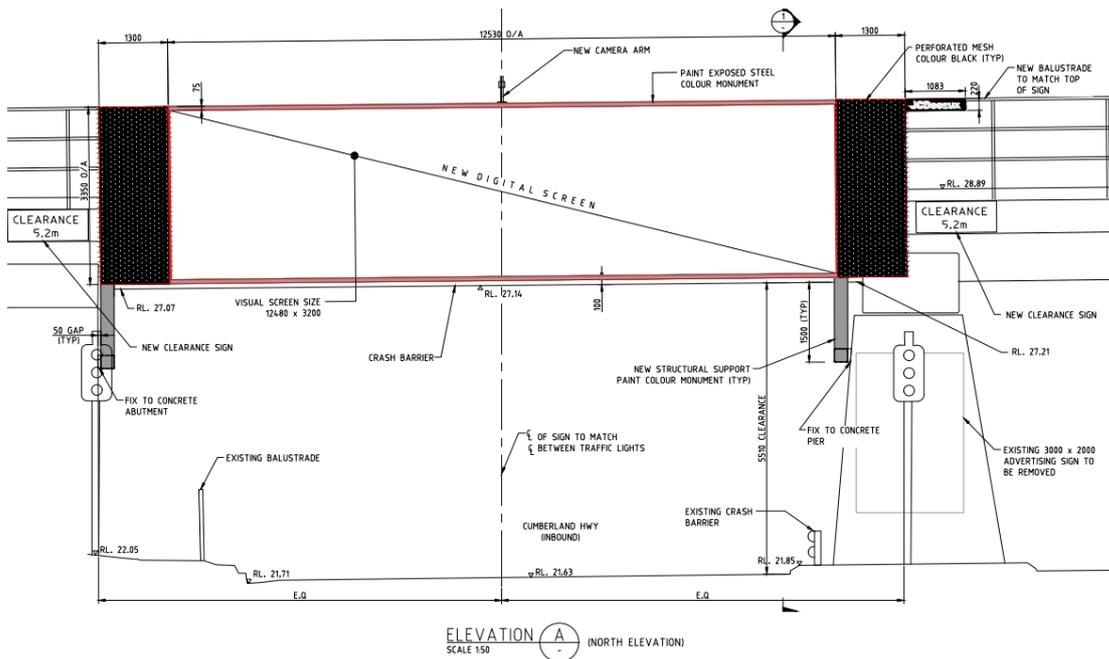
Proposed Elevation (Source: Dennis Blunt Consulting Engineers)
